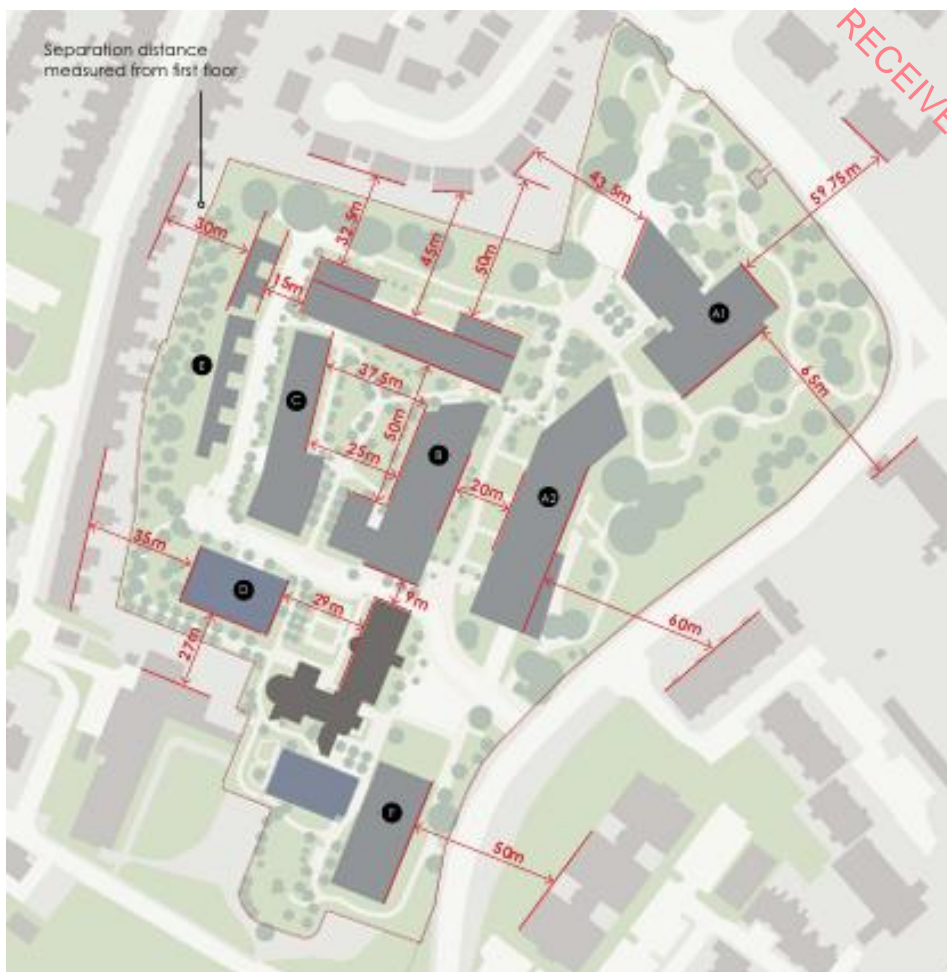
Distances from the proposed development to neighbouring structures as extracted from Section 3.5 of the OMP Masterplan and Architectural Design Statement
